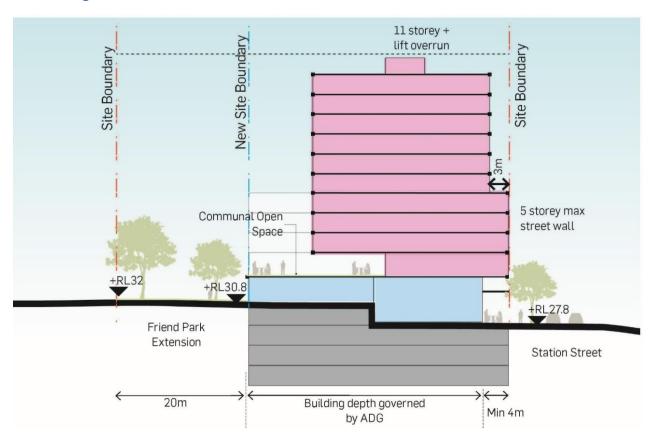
Figure E: Section A-A through Corner of Pritchard Street and Station Street Precinct – typical east-west podium
